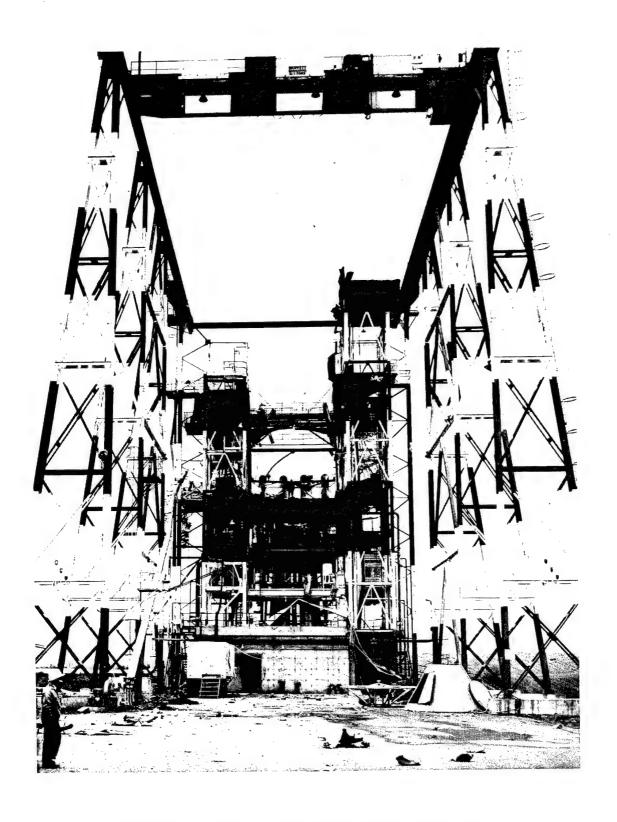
VIEW OF TEST STAND AFTER EXPLOSION
